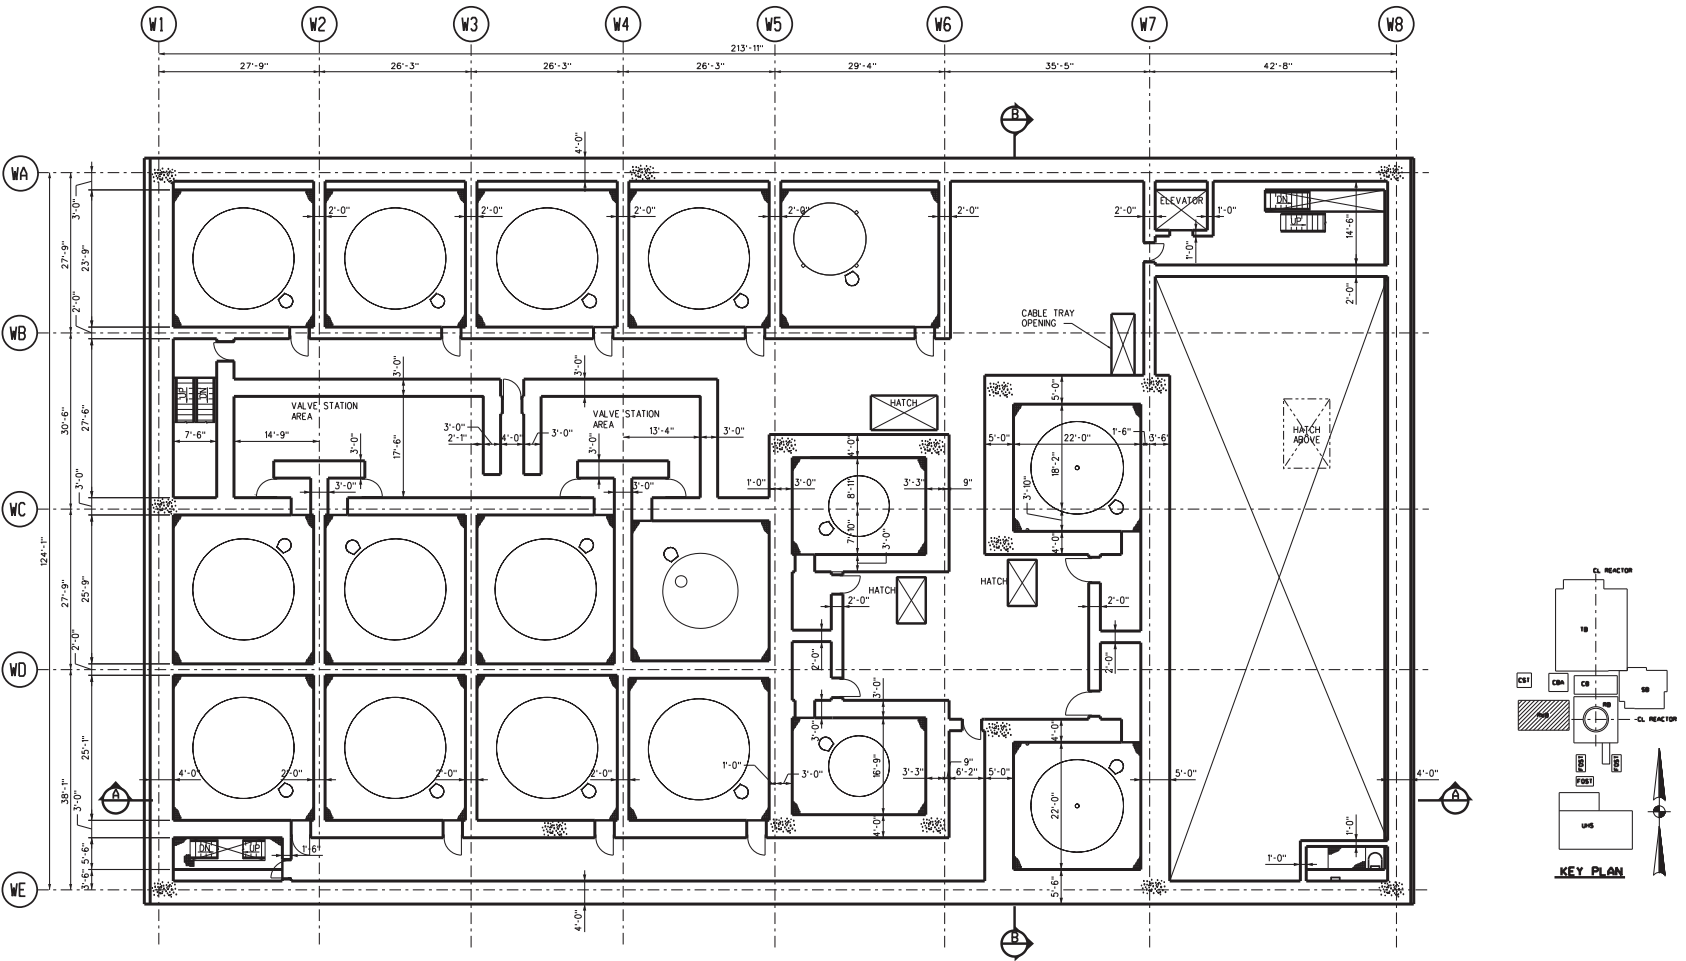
H.3-55 Radwaste Building Floor Plan at Elevation 12'-0"
